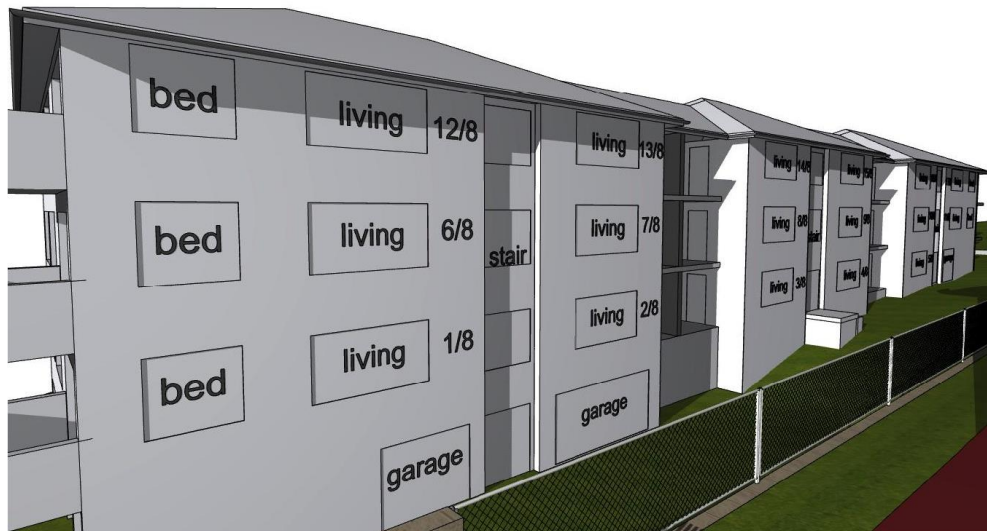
3D Elevational (9.00am, mid-winter) shadow diagram of the adjoining 8 Essex Street building.
